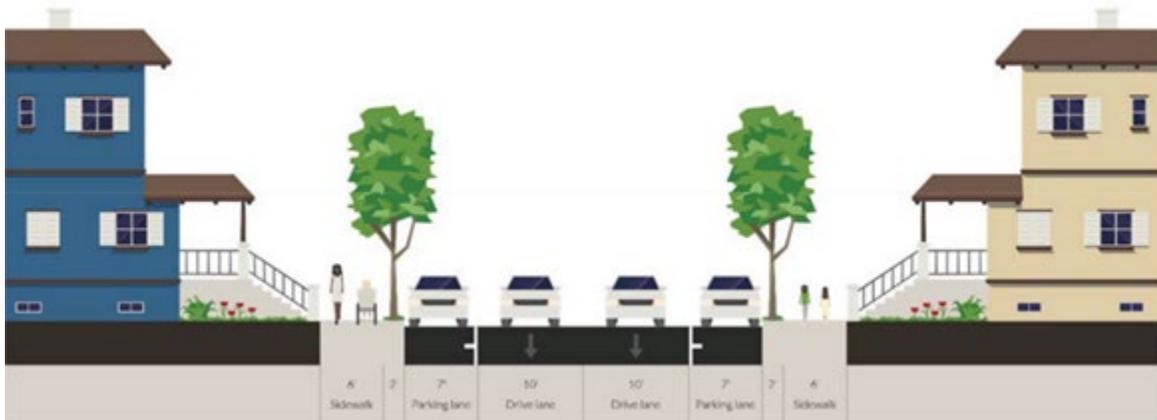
Road A Minor Street Typical Section, 50' ROW with parking on both sides
